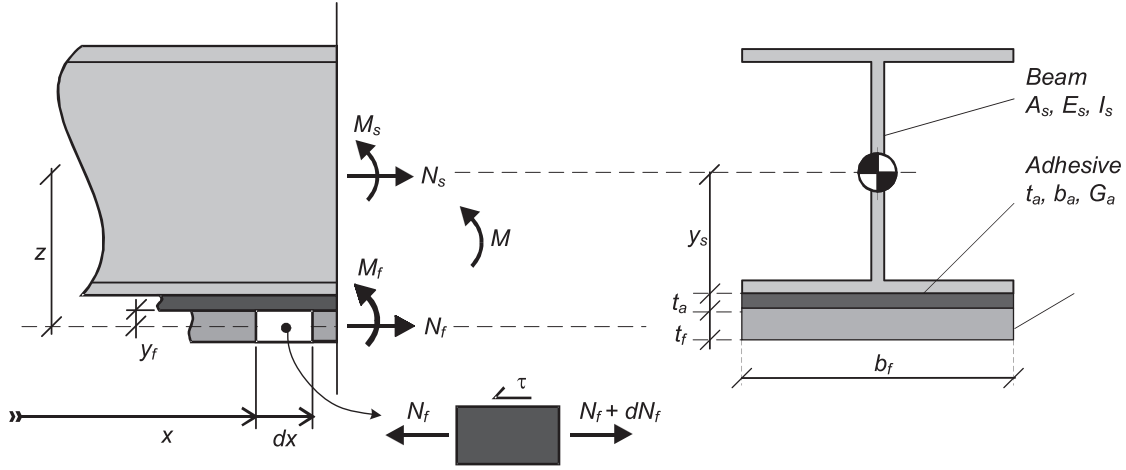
Notation, sign convention and internal forces in the reinforced steel beam.
